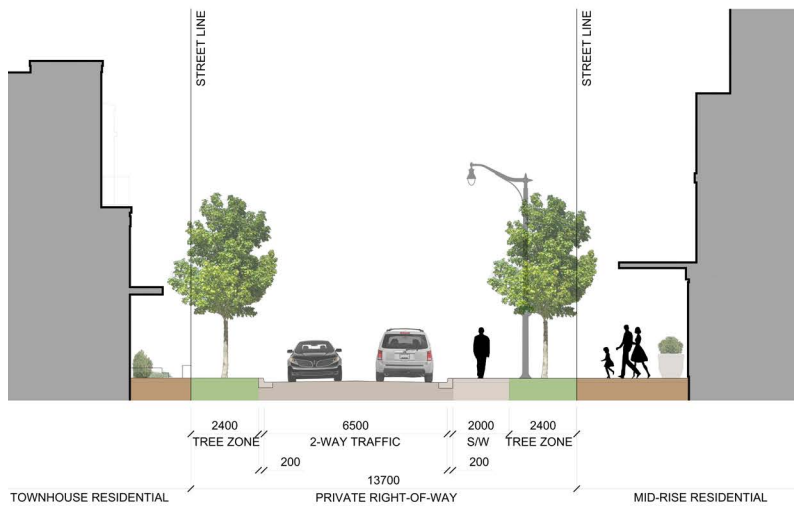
13.7m Private Condominium Driveway - No On-Street Parking
